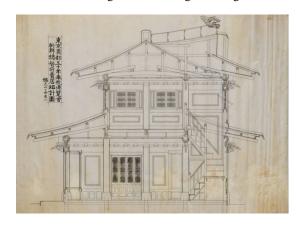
The section drawing of a Korean-style pavilion with Japanese roof frame at the 50th anniversary Expo of Tokyo's capitalization, 1917, source: National Archives of Korea.
